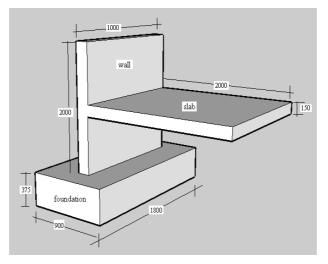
Typical Dimensions of Wall-Slab Sub-Assemblage.
